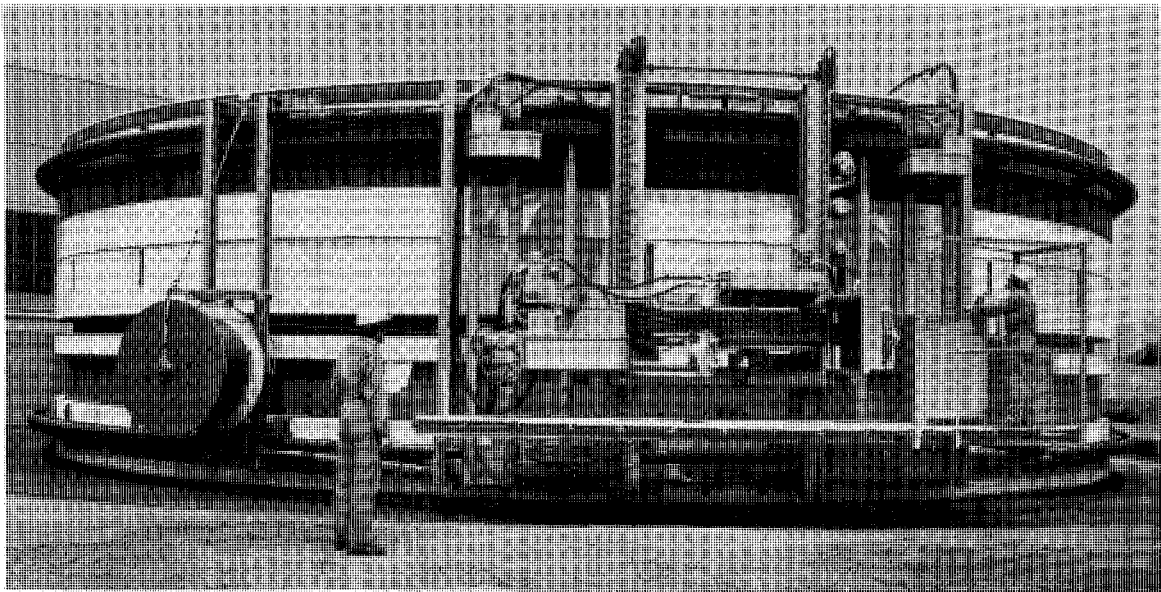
Prototype of the BBR winding machine SW 8500 on test ring
